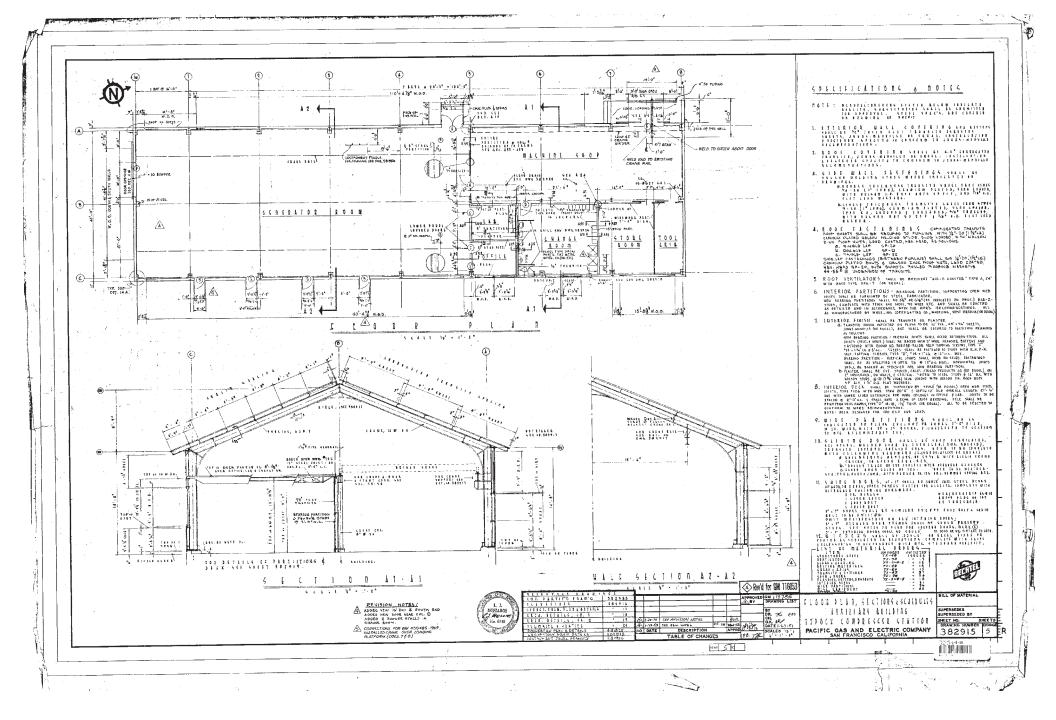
Engineering Drawing No. 382915, Rev. 5 (1970) AOC 25
